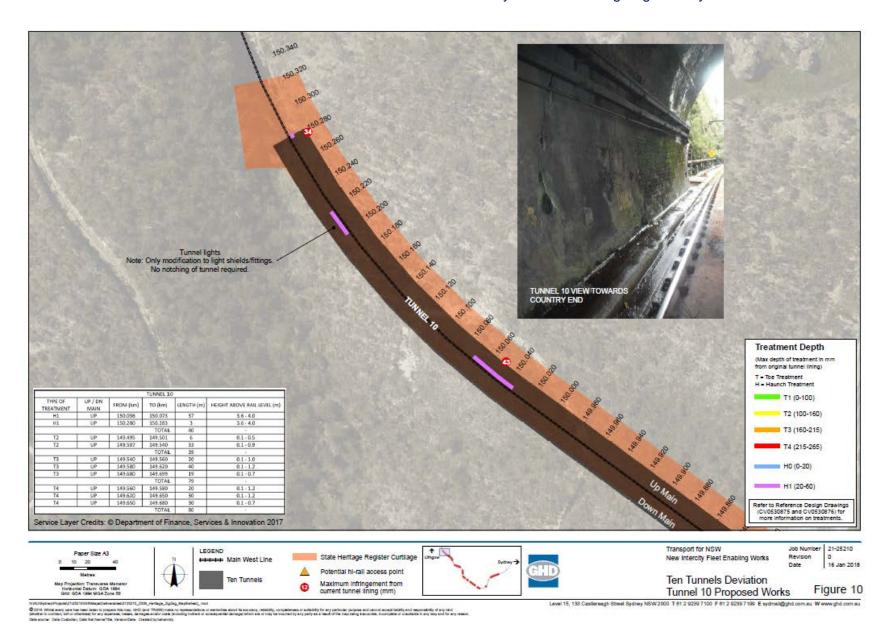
Proposed treatment overview for Tunnel 10 (GHD Great Zig Zag Railway deviation tunnels Heritage Design Summary 2018)
